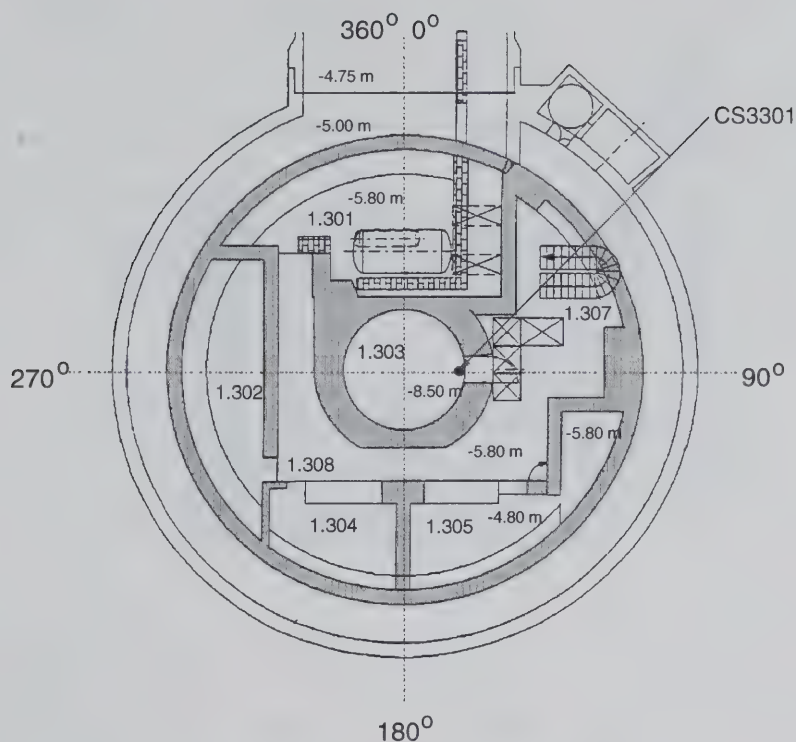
Level 1.200 and 1.300 at the -6.5 m Elevation
